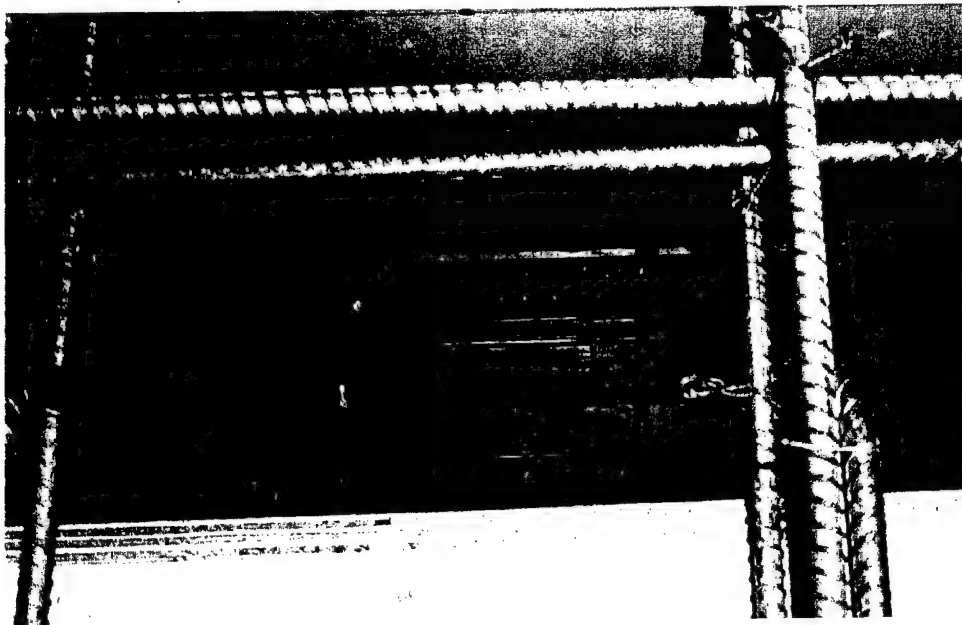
First set of T-beams ready for concrete reinforcing bar cage resting on 2 in. continuous high chair upper
